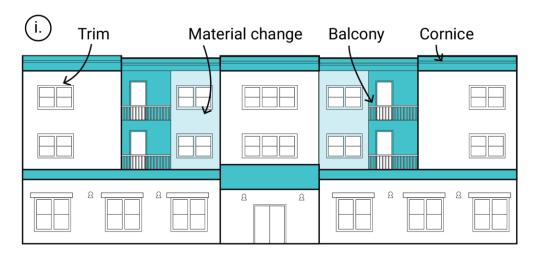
(B)(5)(a)(i): Façade detailing design elements
